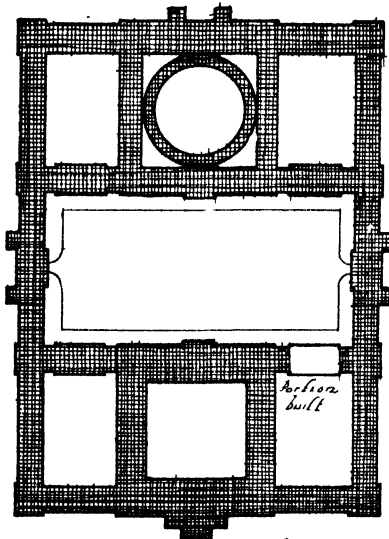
THE BANQUETING HOUSE, WHITEHALL
